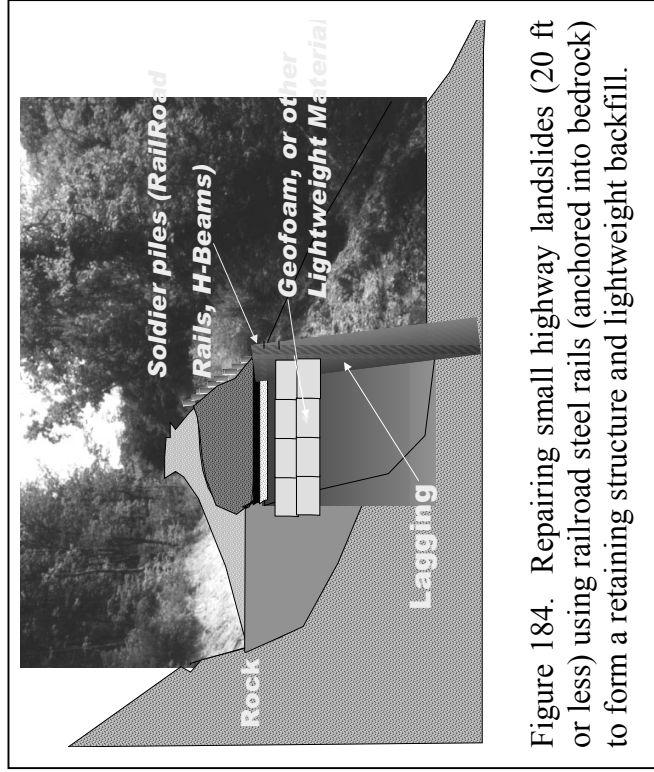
Repairing small highway landslides (20 ft or less) using railroad steel rails (anchored into bedrock) to form a retaining structure and lightweight backfill.
